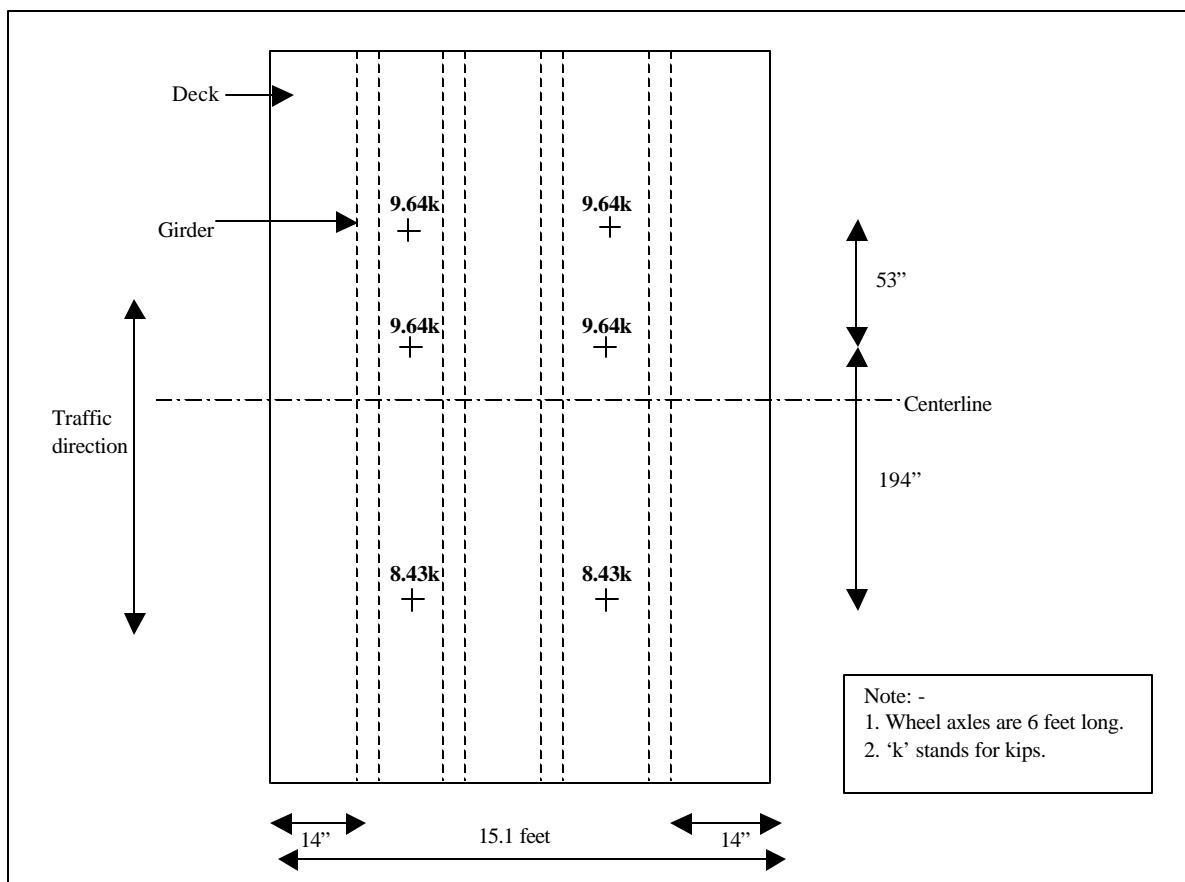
Plan layout of the Tuscaloosa Bridge, Alabama
